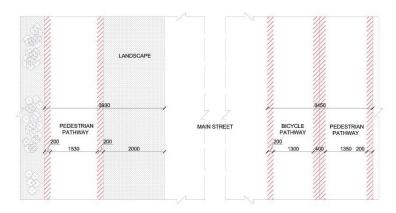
Street width and buffer spaces (in mm) for Gateway 2 in the area surrounding Offenbach am Main Hauptbahnhof
